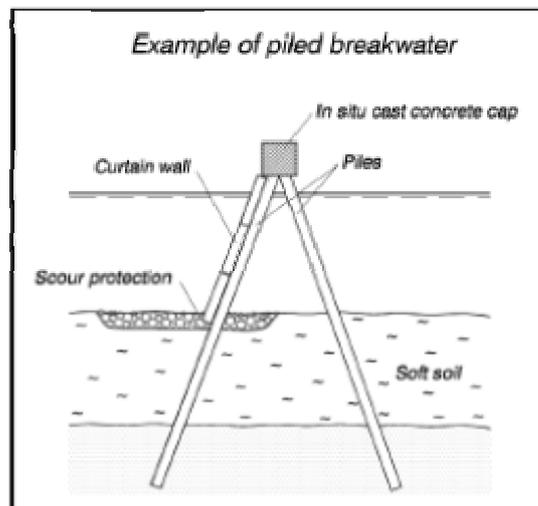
Cross-section of Piled Breakwater (CEM, 2003)
